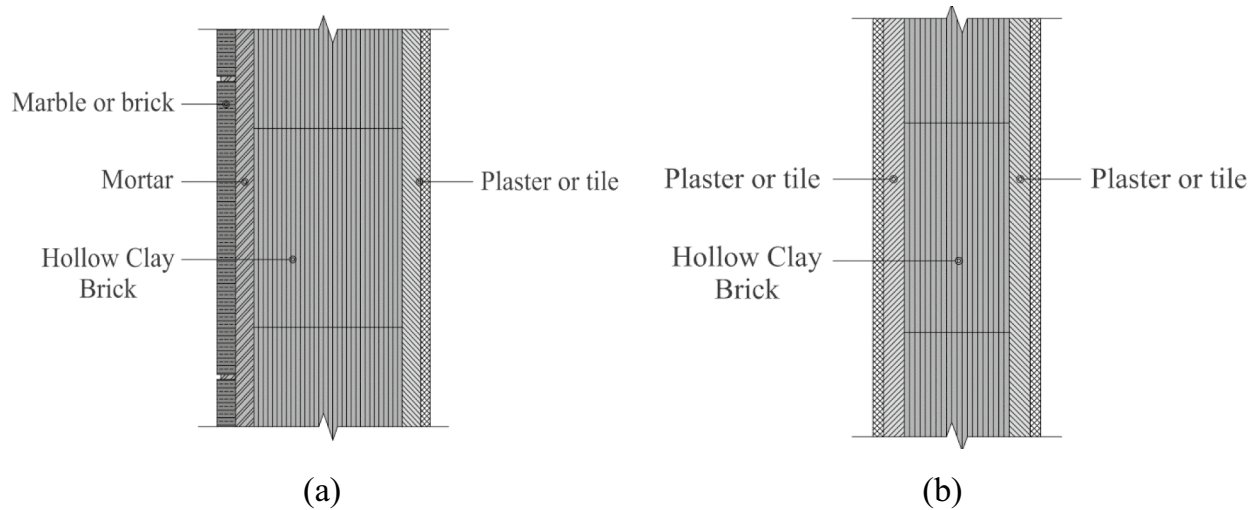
Cross-section details of the structural elements; a external and b internal walls for the building with common materials [3].
